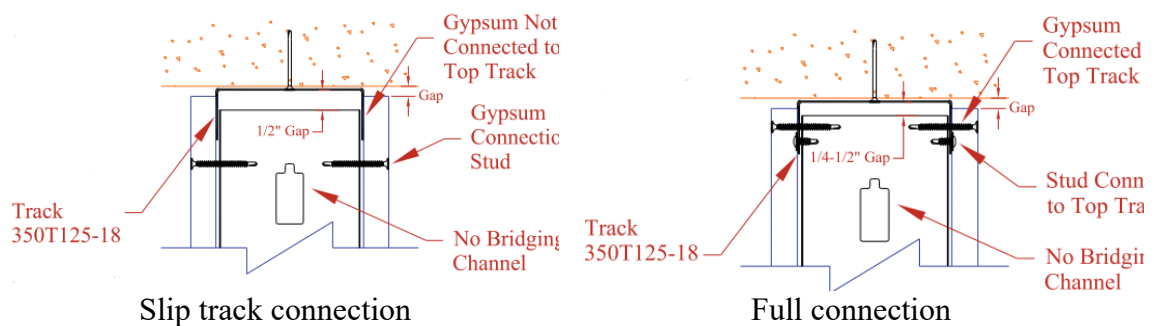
Slip track and full connection detailing (Davies et al. 2011).
